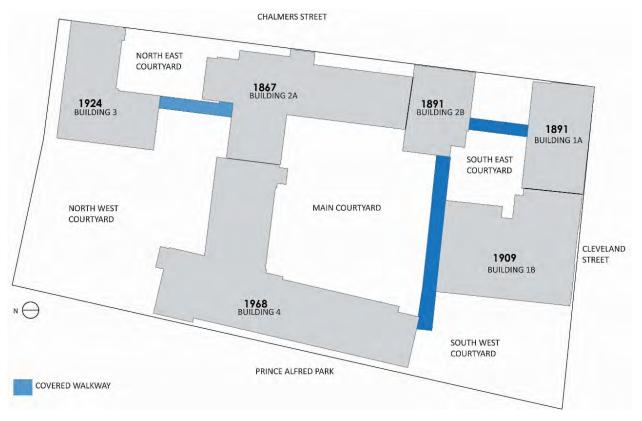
DIAGRAMMATIC PLAN SHOWING THE LAYOUT OF THE CURRENT BUILDINGS ON THE SITE. NOTE THAT BUILDINGS 1 AND 2 EACH COMPRISE A LATER ADDITION AND ARE KNOWN AS BUILDINGS 1A & 1B AND BUILDINGS 2A & 2B RESPECTIVELY.
